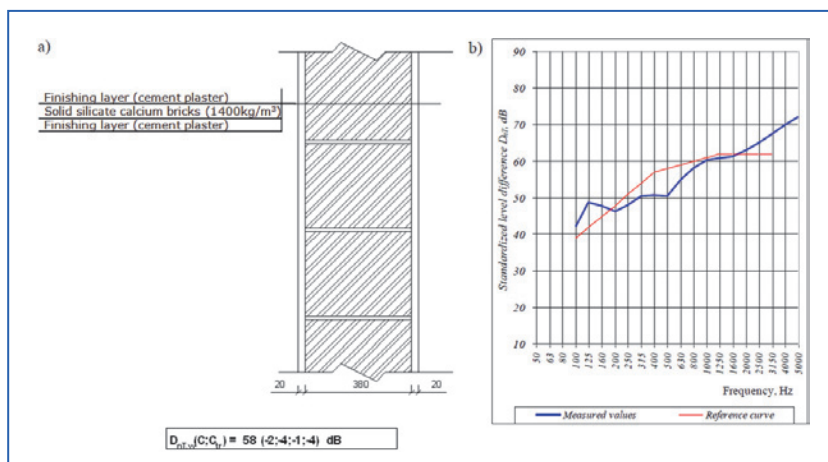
Separating heavyweight single wall: a) cross-section of the wall, b) graph view of standardized level difference values.
